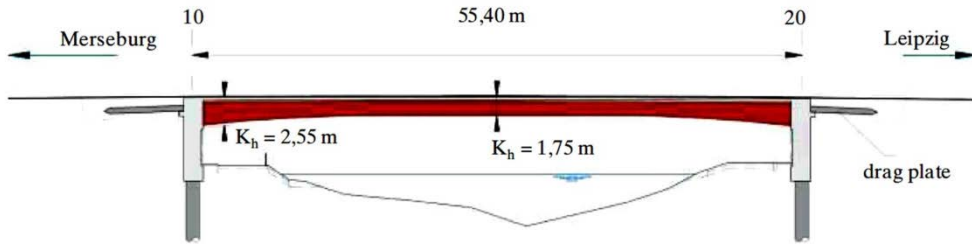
Elevation layout of a FIAB in Germany (Weizenegger, 2003)
